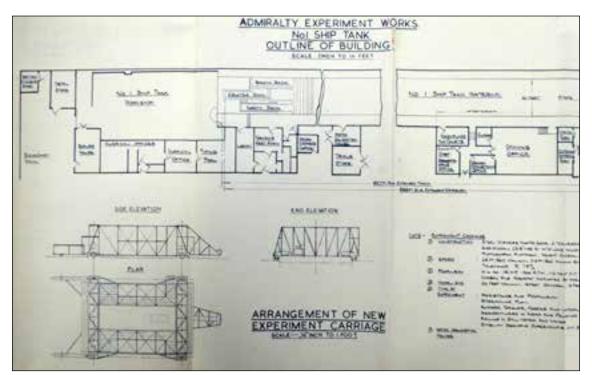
Plan, elevation and section of No 1 Ship Tank in 1958 (TNA ADM 226/644)
